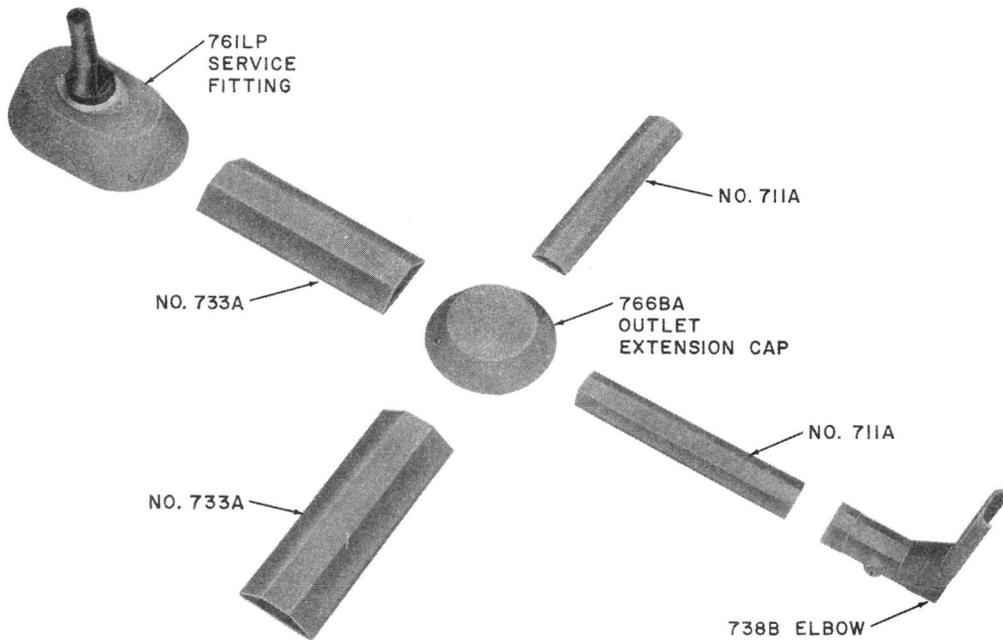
Florduct Metal Overfloor Duct (Sheet 2 of 2)
